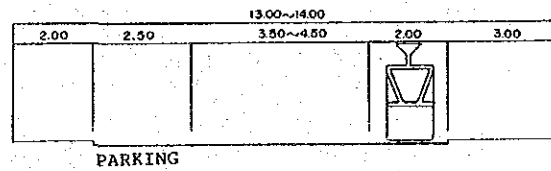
CROSS SECTIONS OF MAIN ROADS (3)
